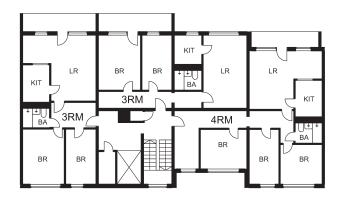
Original plan of a normal floor in the middle segment of a WBS 70 building. Adapted from "Plattenbau" (n.d.).
